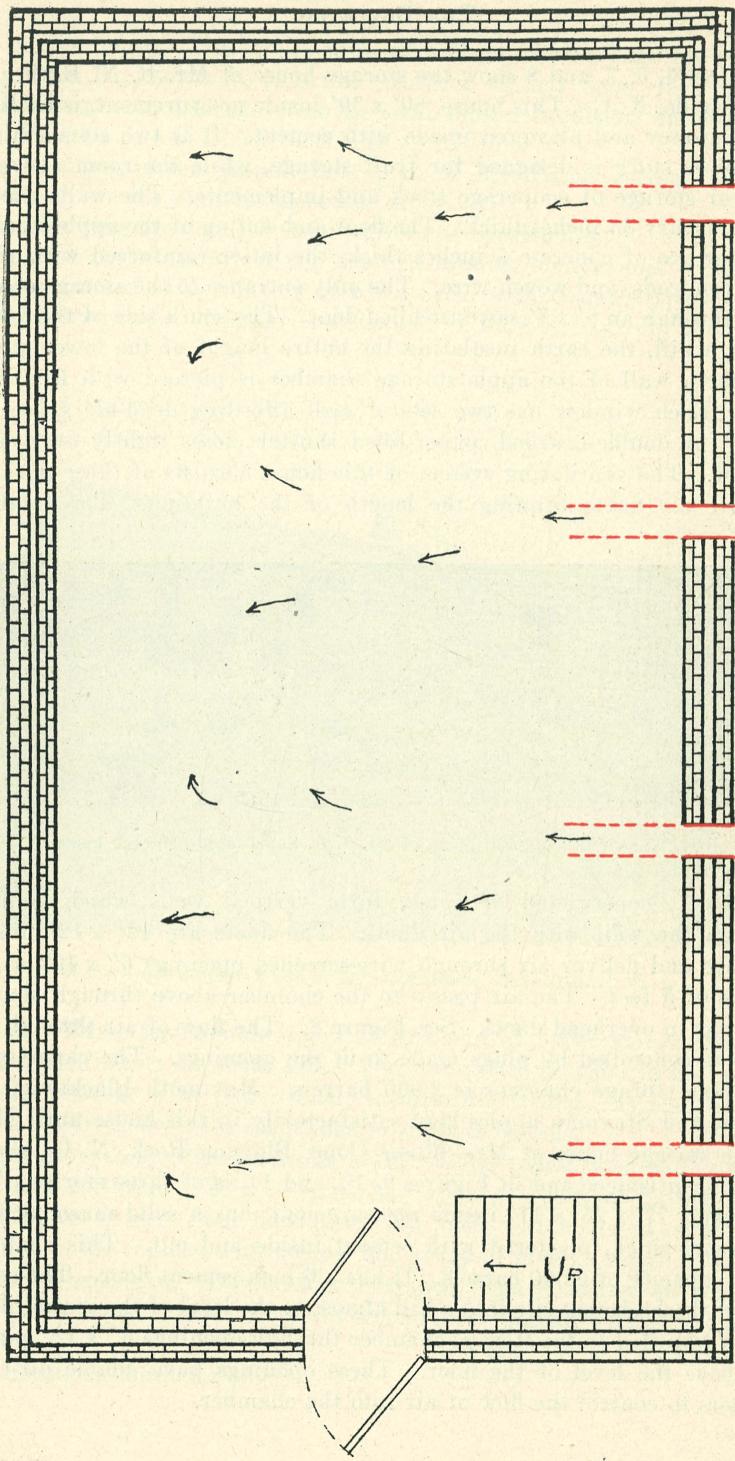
Ground floor of Mr. J. R. Sams' apple storage house, showing ventilating system.
